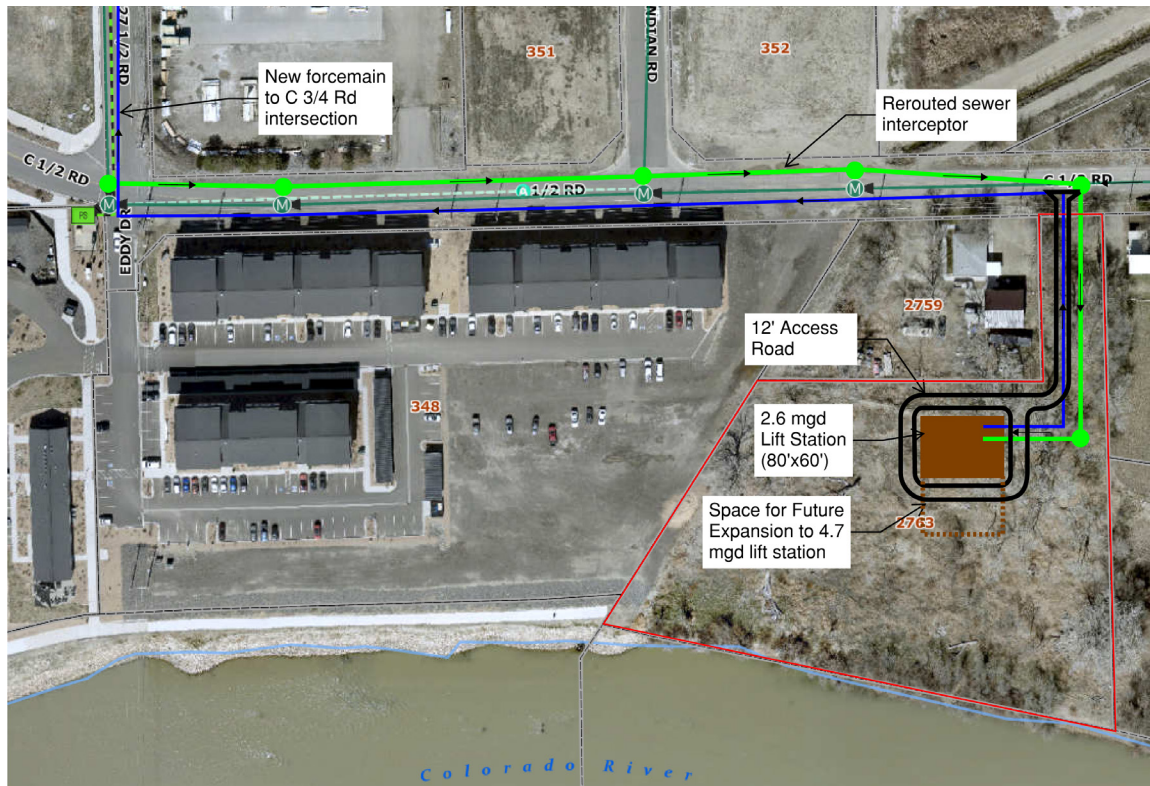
Preliminary GVBPLS Site Layout at 2763 C 1/2 Rd
